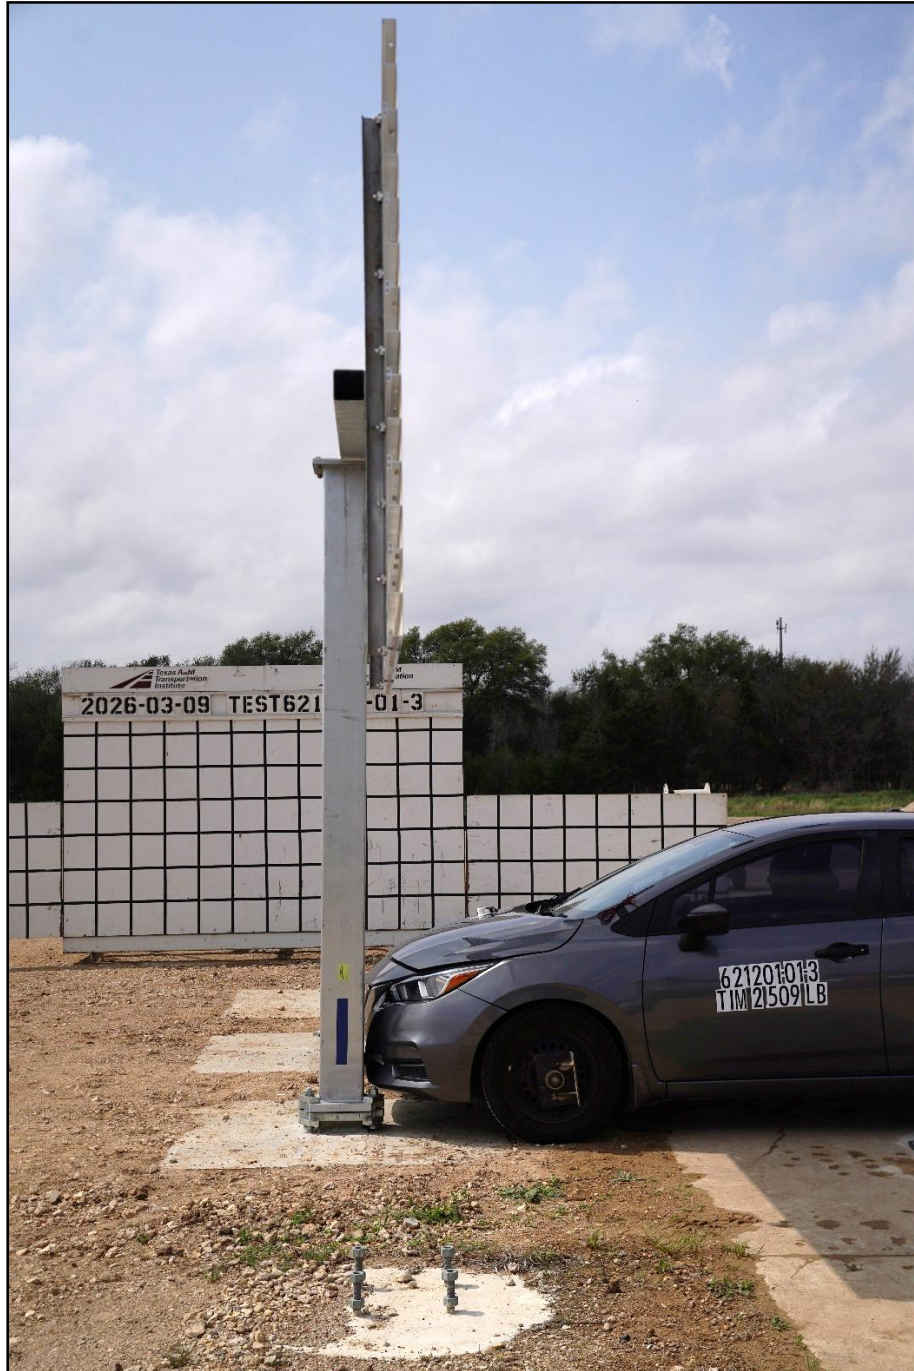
Right Angle View of the 8 × 8 Square Tube Slip Base Sign Support System prior to Testing.
